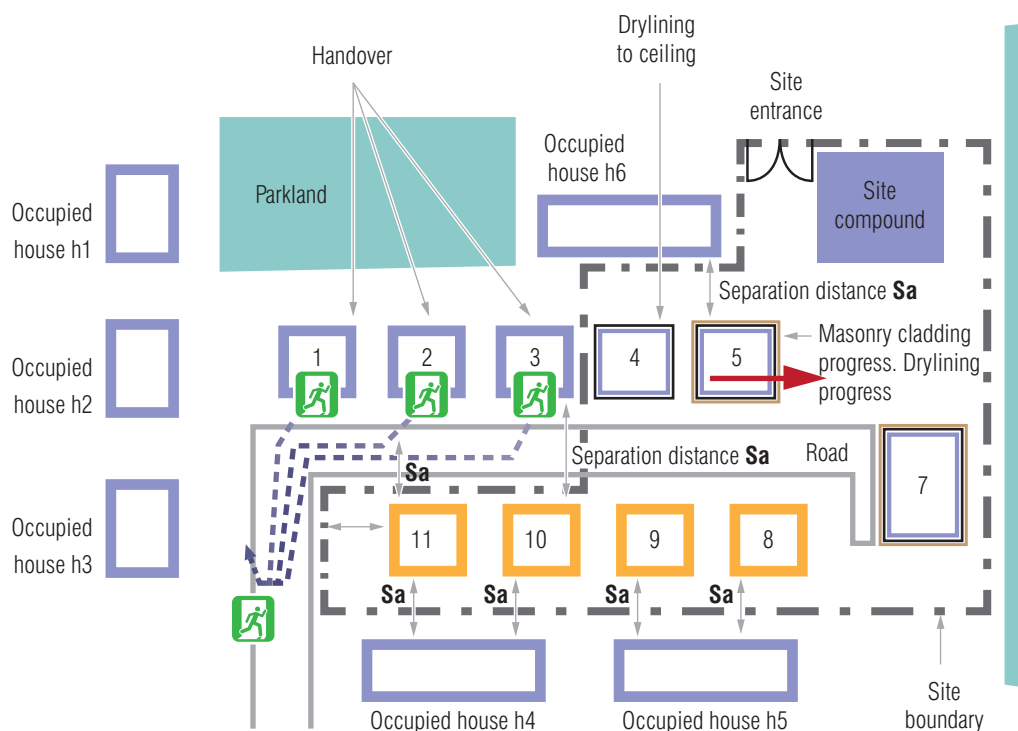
Site progression with masonry cladding and drylining works in units 1 to 4
